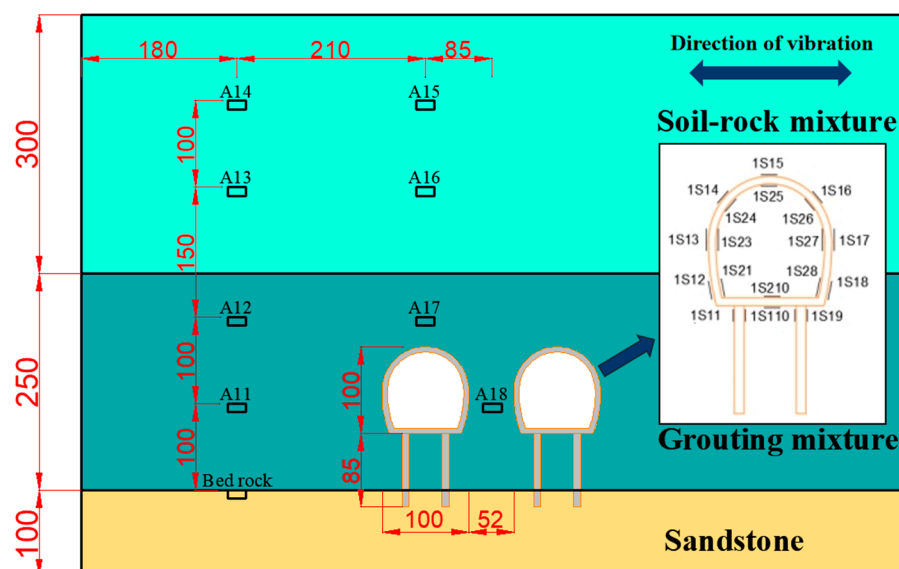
Simplified cross-section of the tunnel and layout of monitoring sensors (unit: mm).
